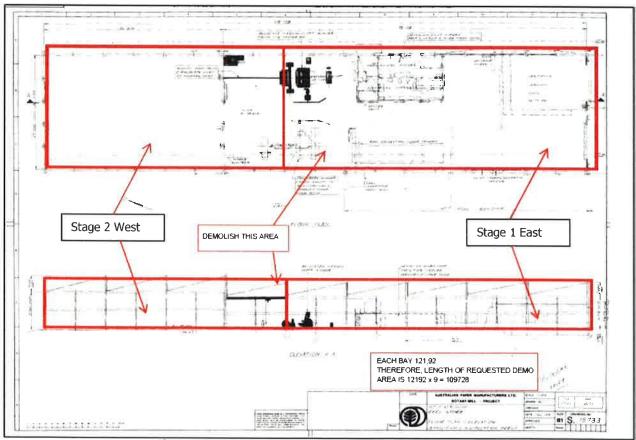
| Plan and Long Section of proposed demolition of B7 reel store
